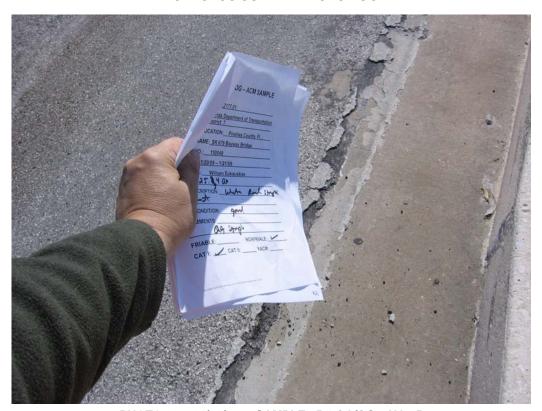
01/21/09 - SAMPLE 25.4 QA/QC - HA 25 WHITE PAINT ROAD STRIPES
